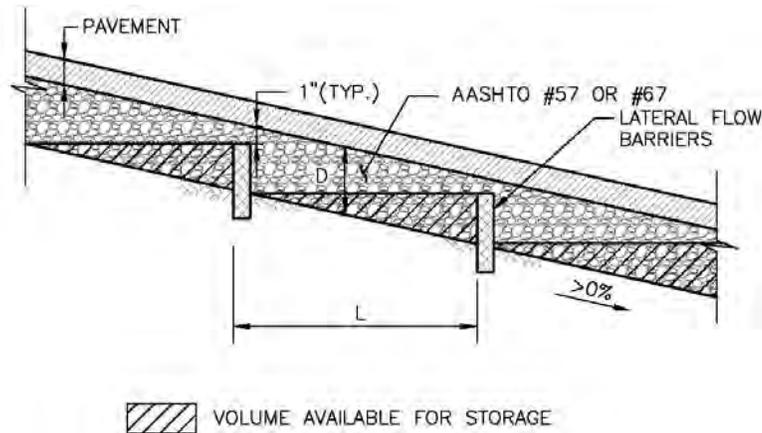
Permeable Pavement Profile, Sloped Installation.
